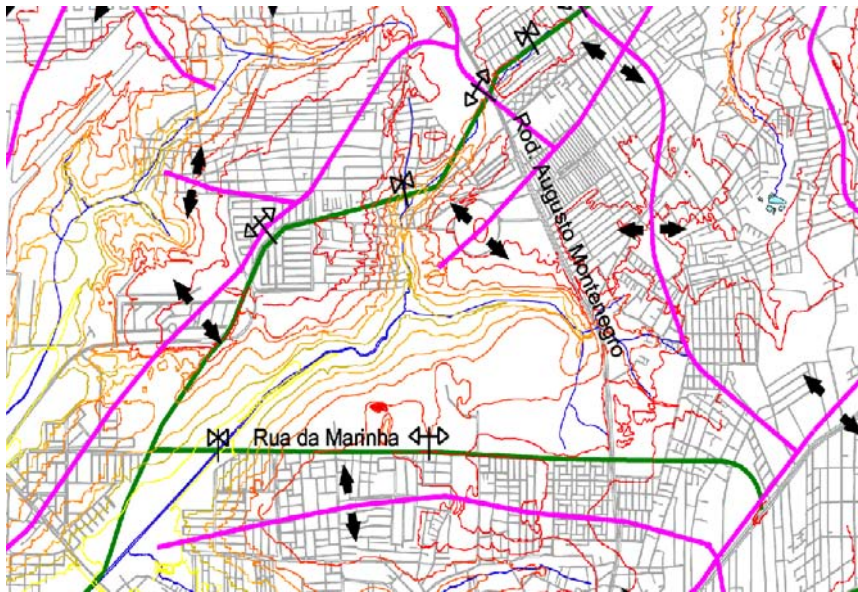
Proposed Drainage Plan for Rua da Marinha
